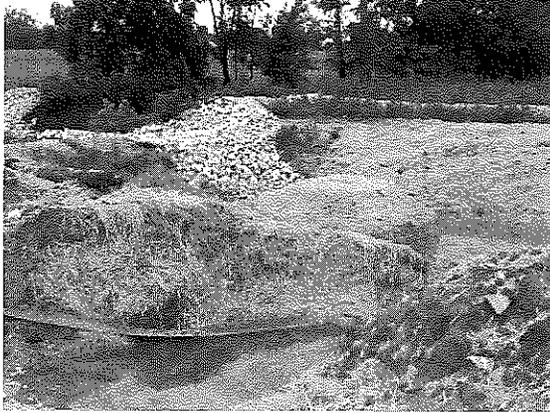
Straw blown onto filter stone and inlet stand pipe of sediment basin at Sta. 934+00
